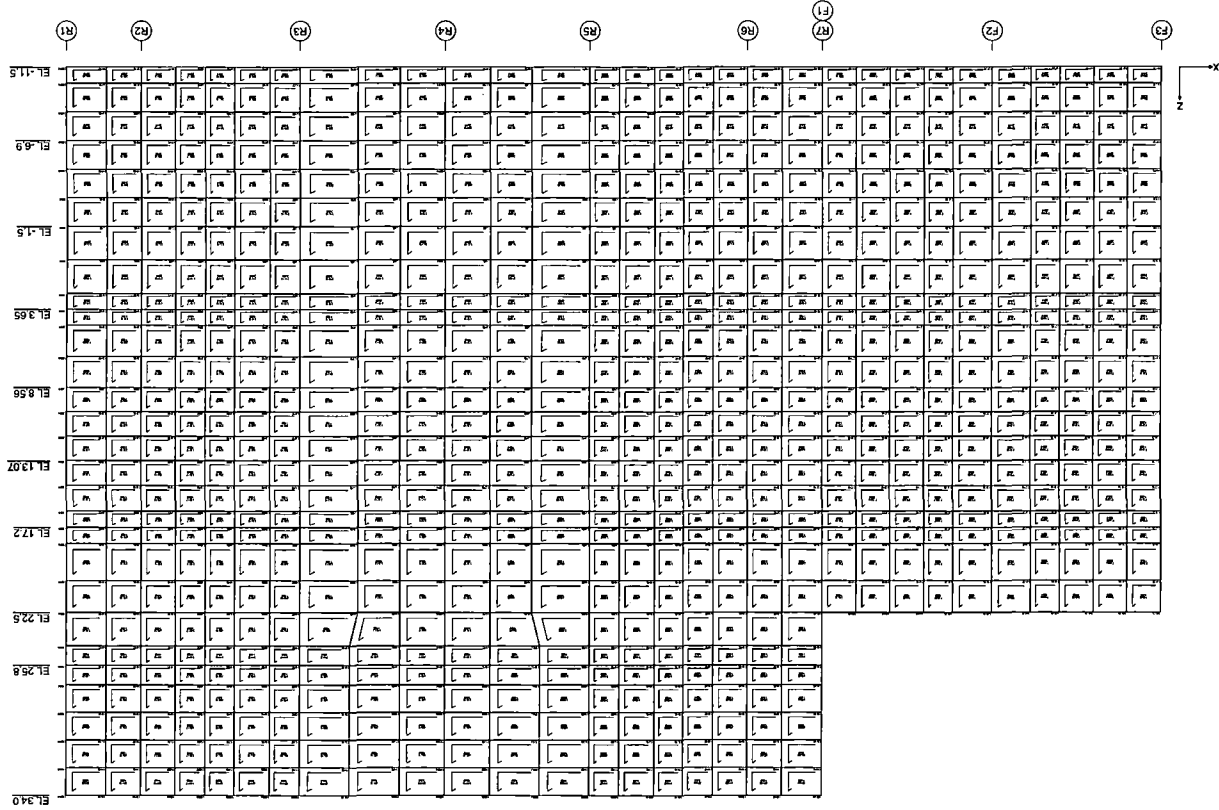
FE Model of the External Wall (RA/FA Column Line)
